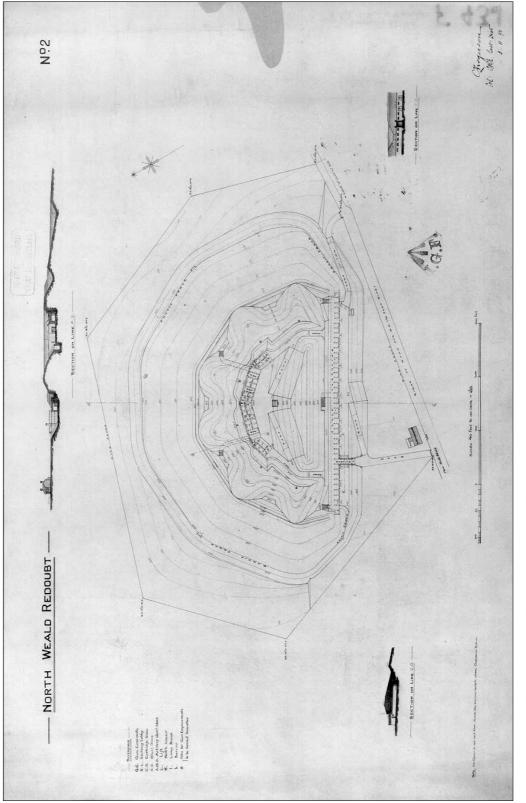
North Weald Redoubt - 1892 Plan and sections (PRO WO/78/2404/2)
